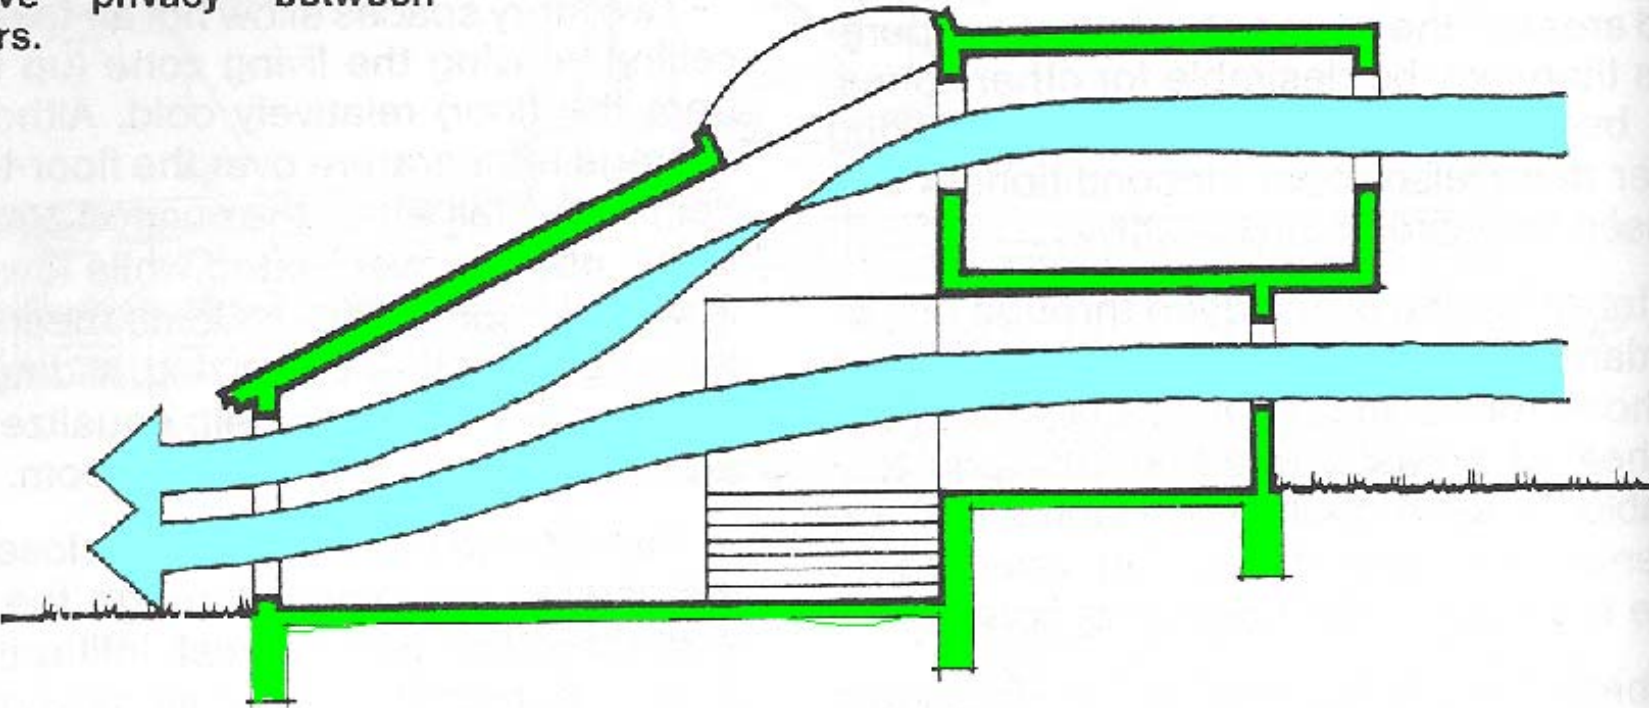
Building acts as an air flow dam—within residential scale construction, higher facades mean greater pressure and better air movement through dwelling.
